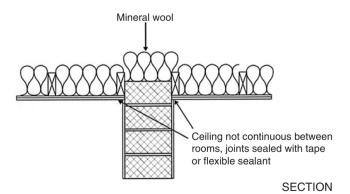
Ceiling void and roof space (only applicable to rooms for residential purposes)
